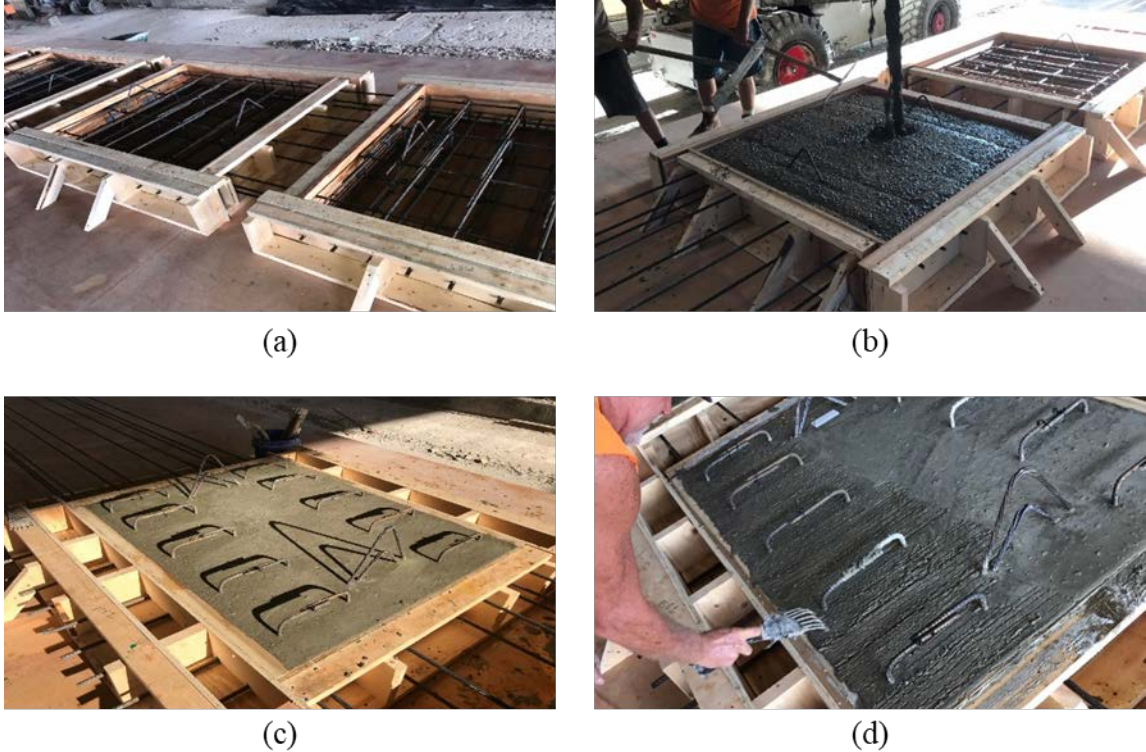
Construction of specimens: (a) specimen form and reinforcement, (b) concrete pour, (c) finished cast, and (d) surface raked finish for FSB control
